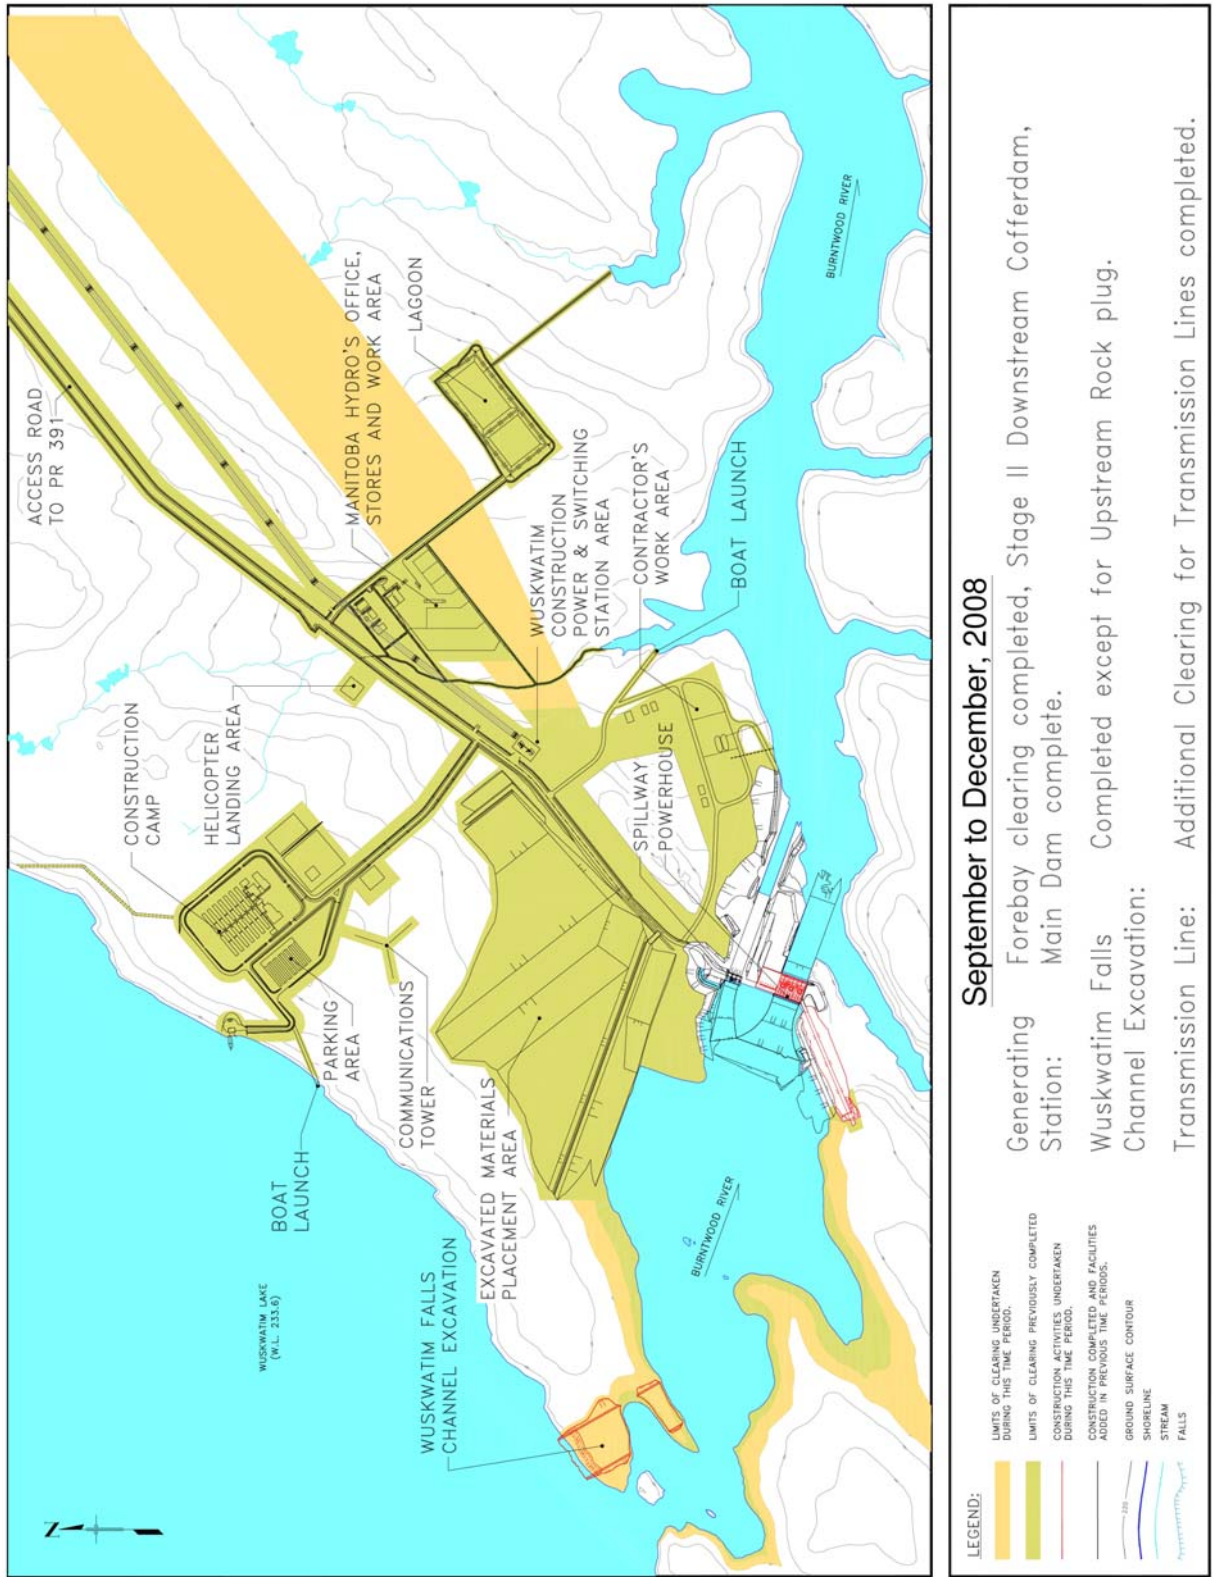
Proposed Construction Activities - September to December 2008
